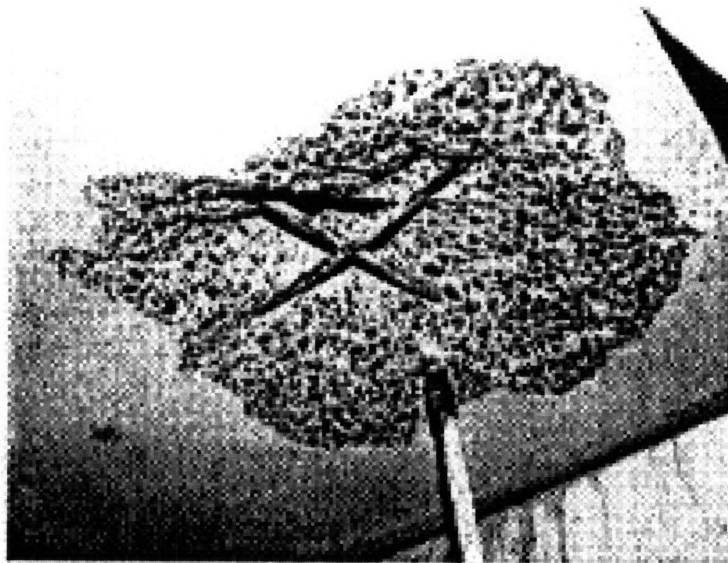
Exposed rebar resulting from concrete spalling [7]
